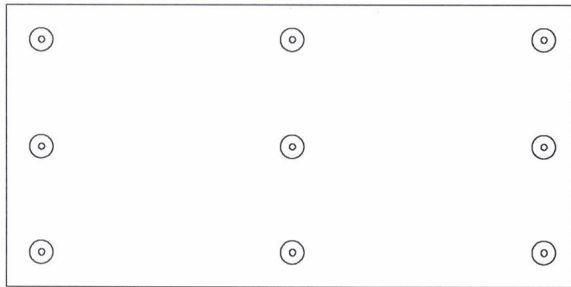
Fastener pattern (9 No. per board) Board size to 2.270 x 1.200 m – 3.3 fixings/m²
